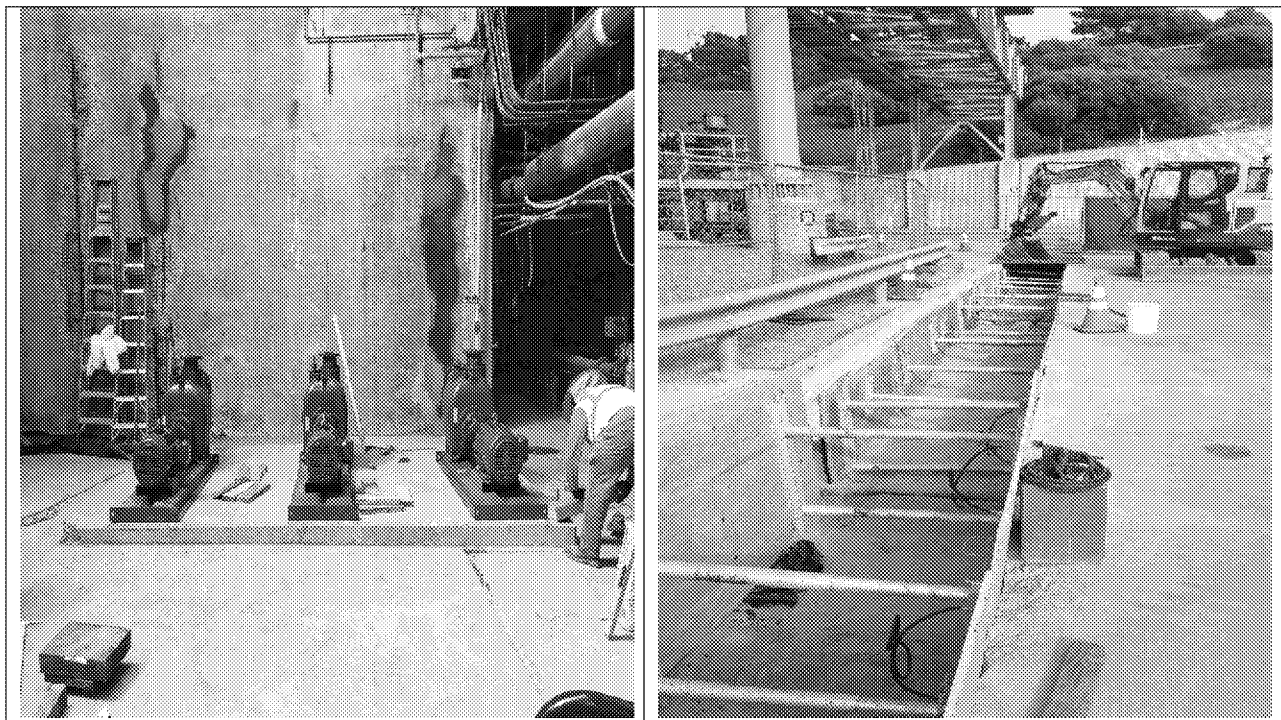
Central Storm Drain Rerouting Project (in Construction)
